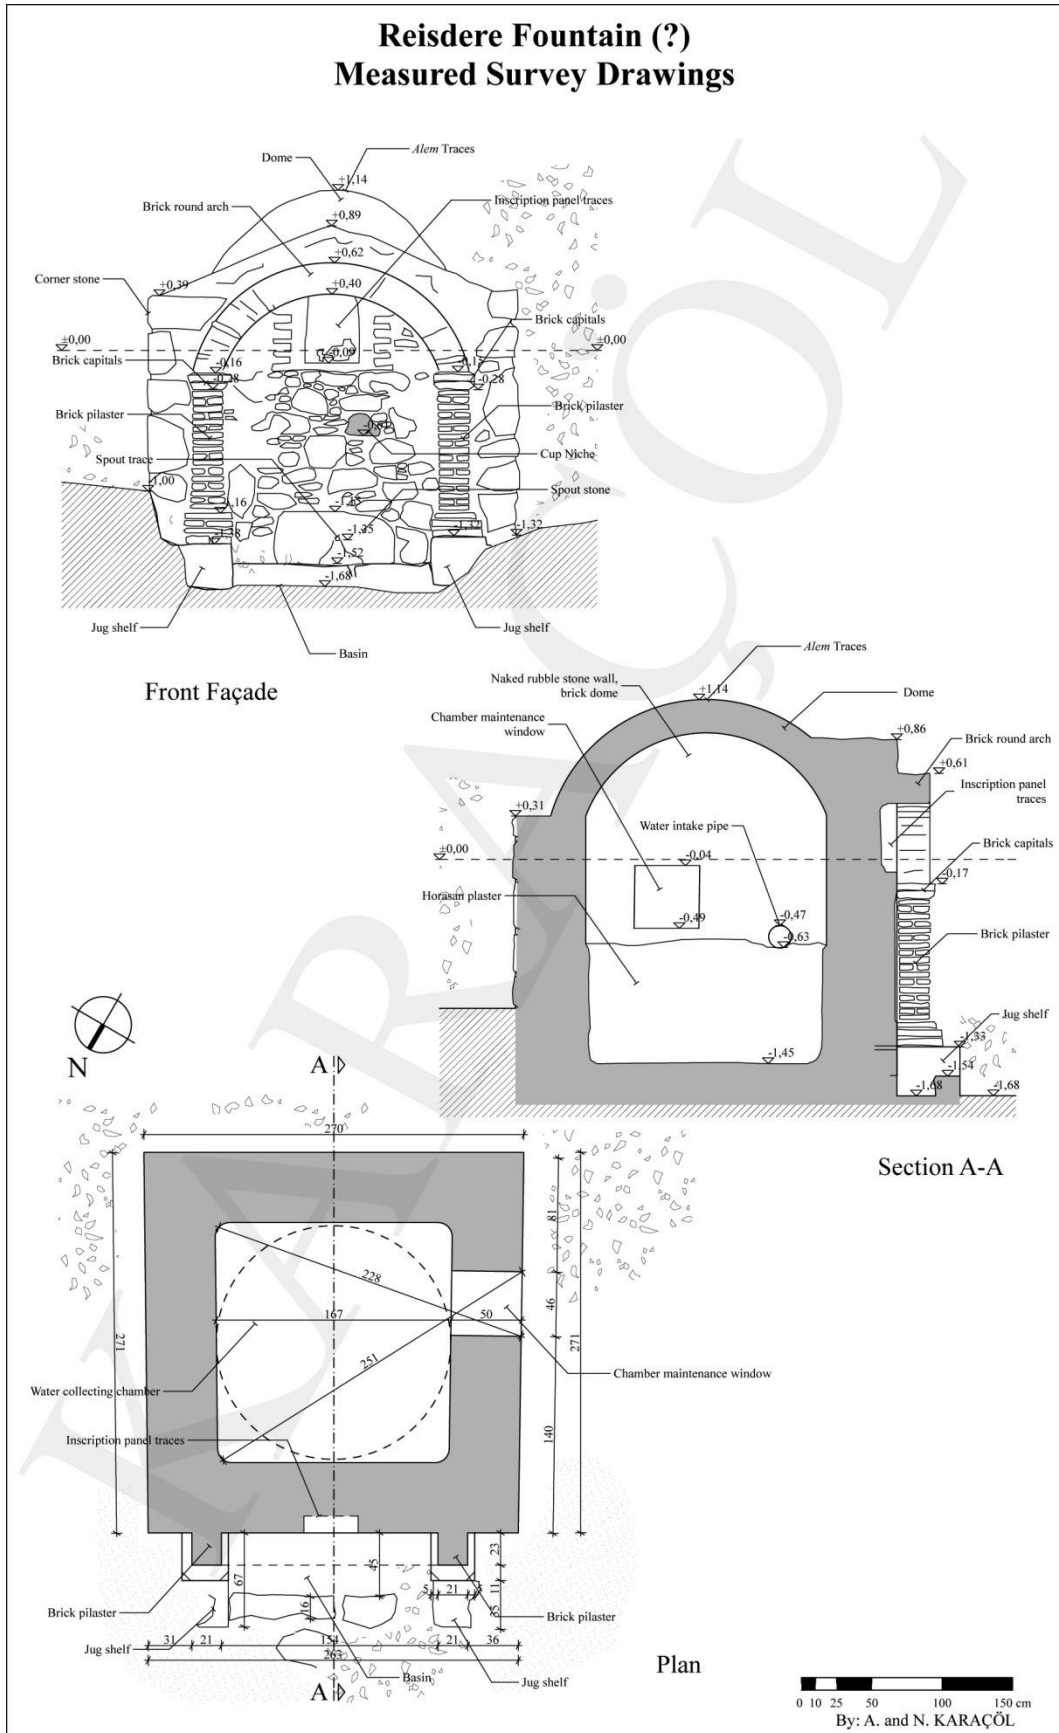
Reisdere Fountain front façade, section and plan drawings
